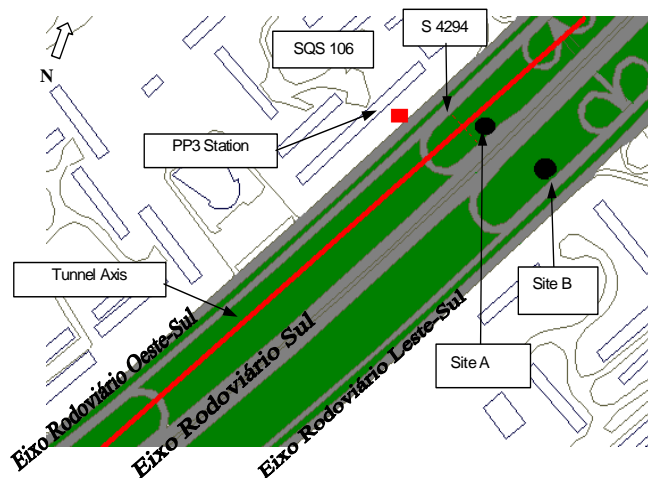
Specific in situ testing areas and tunnel S 4294 cross section
